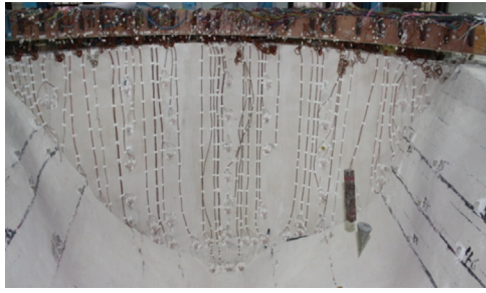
Arrangement of strainmeters on dam face in downstream area of model (1:250).
